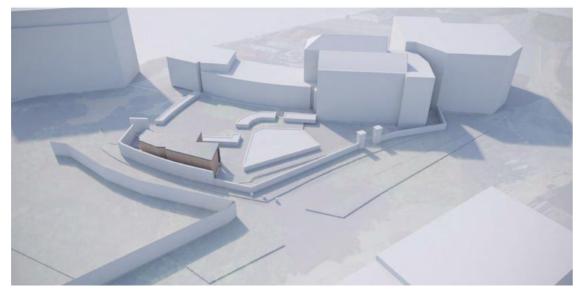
Proposed arial view showing outbuilding in relation to front garden and host listed building
